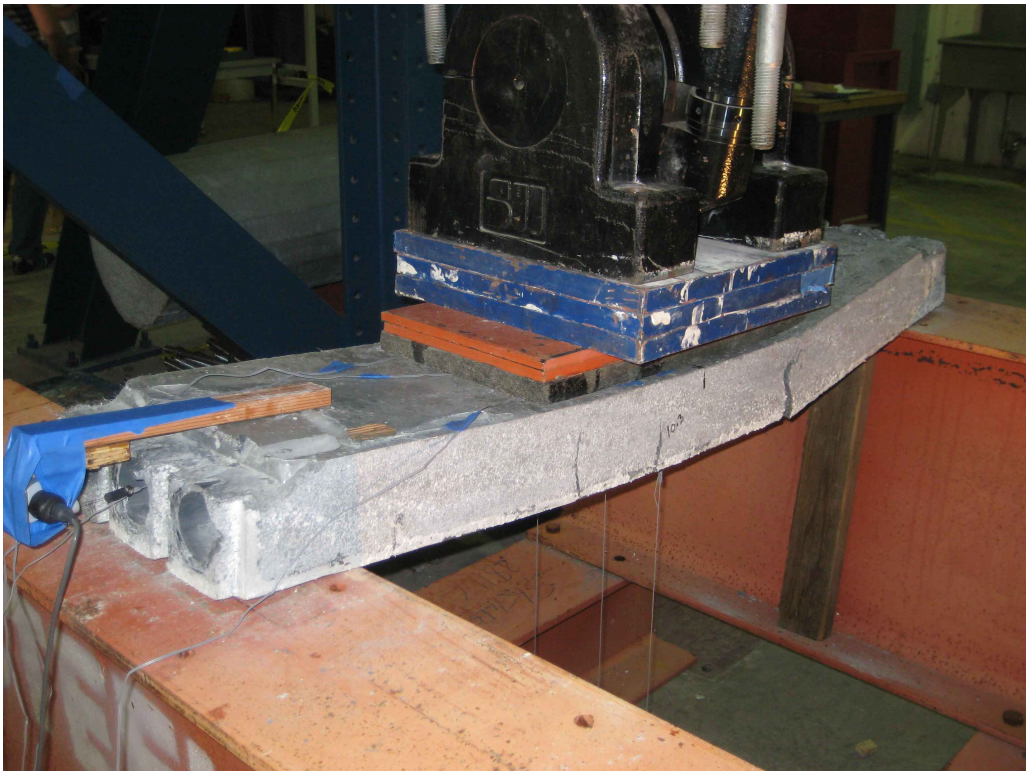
Uniform Section Ductal®-FRP Deck Specimen after Failure
